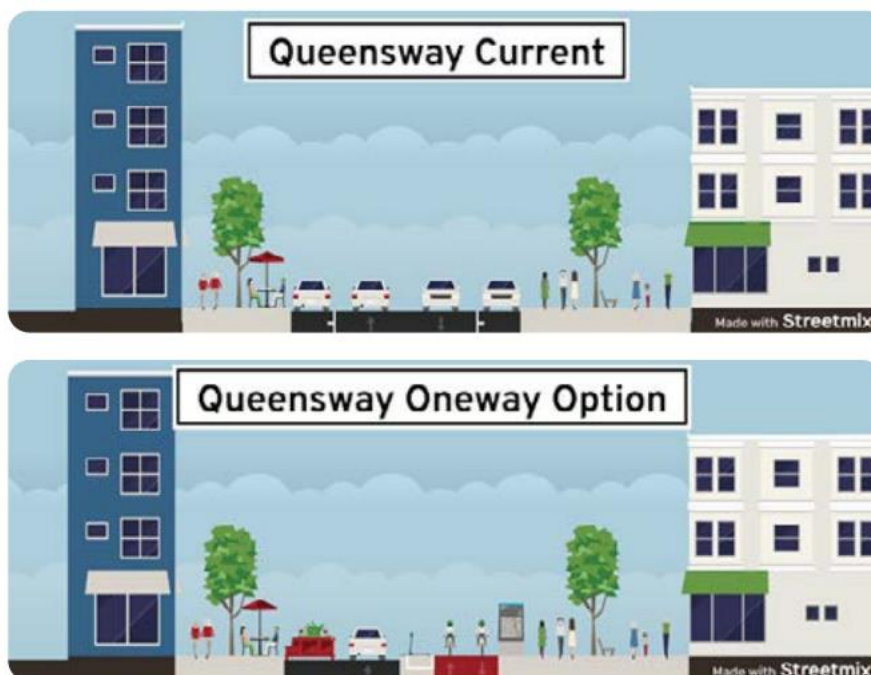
Current & Future Illustrative Queensway, Street Sections
